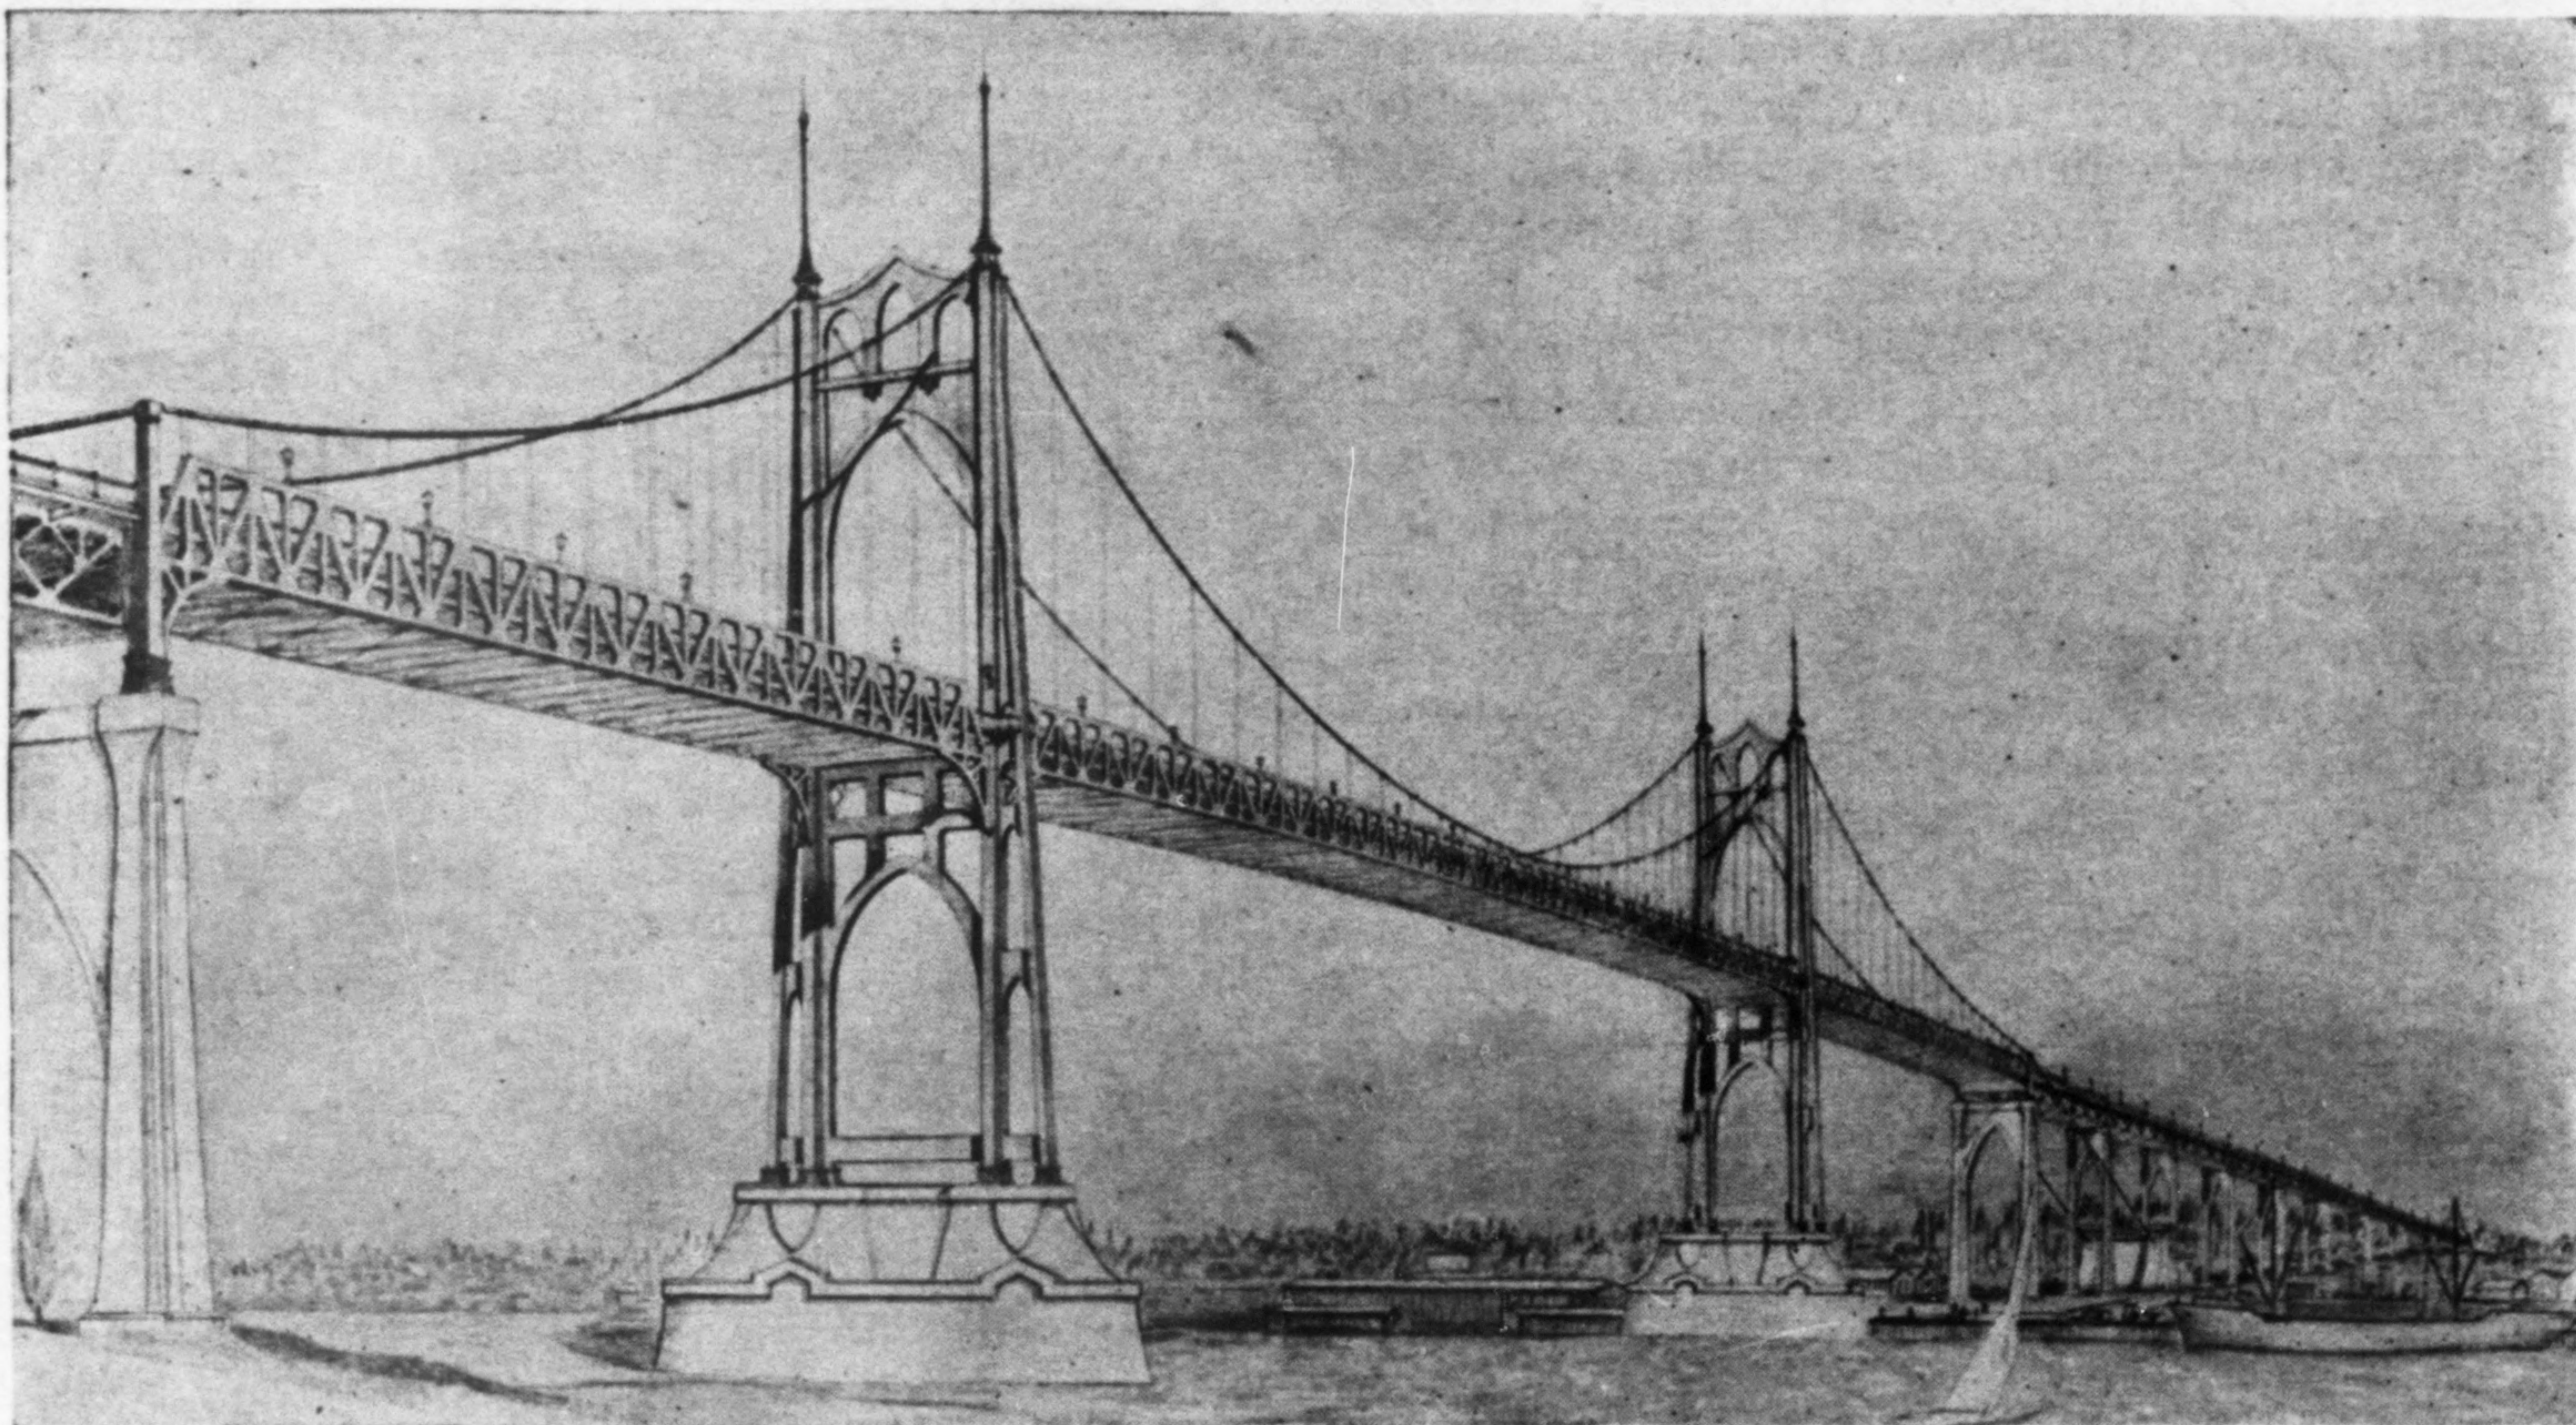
NEW ST. JOHNS BRIDGE AT PORTLAND, ORE., AN ARTIST'S CONCEPTION
